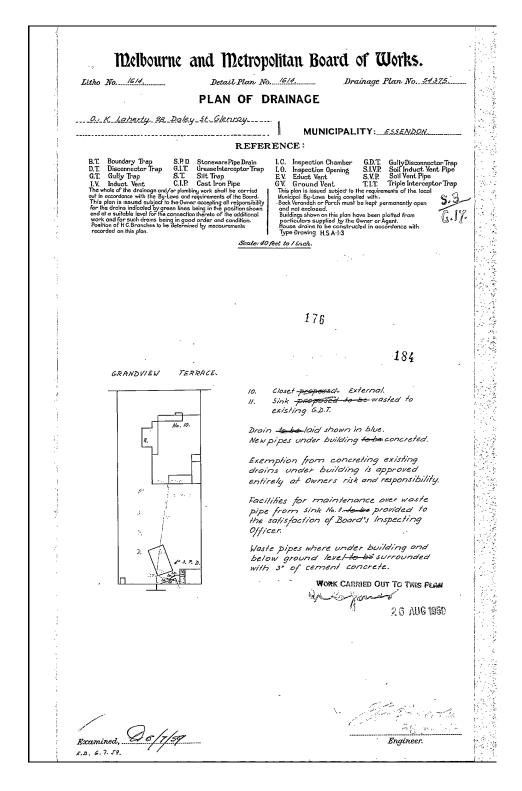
MMBW Property Drainage Plan No.54375 (dated 1959) showing the footprint of the dwelling at 10 Grandview Street (numbered 16) at that time. Source: Casey Inspection Services.
